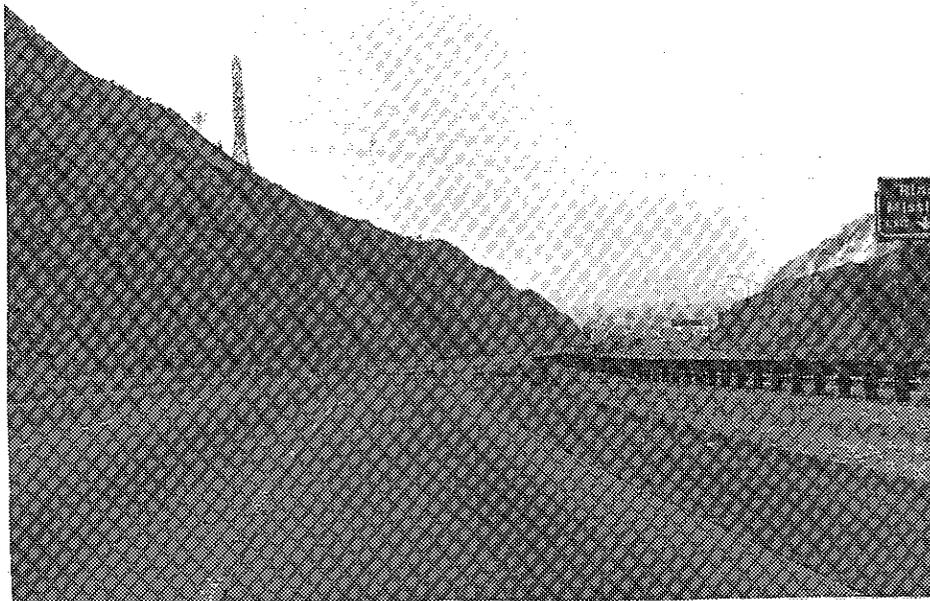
Looking southerly at northbound lanes of Route 405. Fault zone is believed to extend across the roadway in the area of broken pavement.
